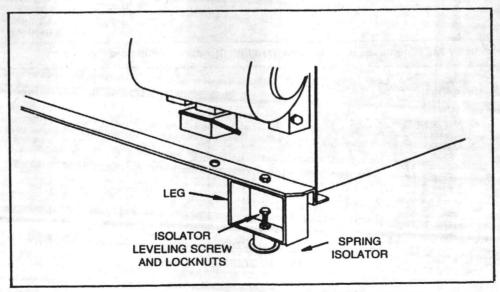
Attaching the Mounting Leg and Spring Isolator to the High Pressure Sprayed Coil Unit
